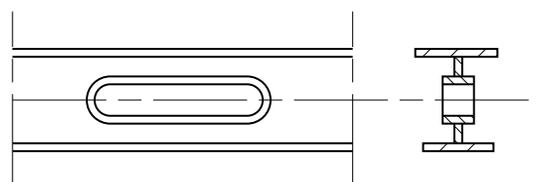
Stiffening of large openings in primary supporting members - Solution 2
